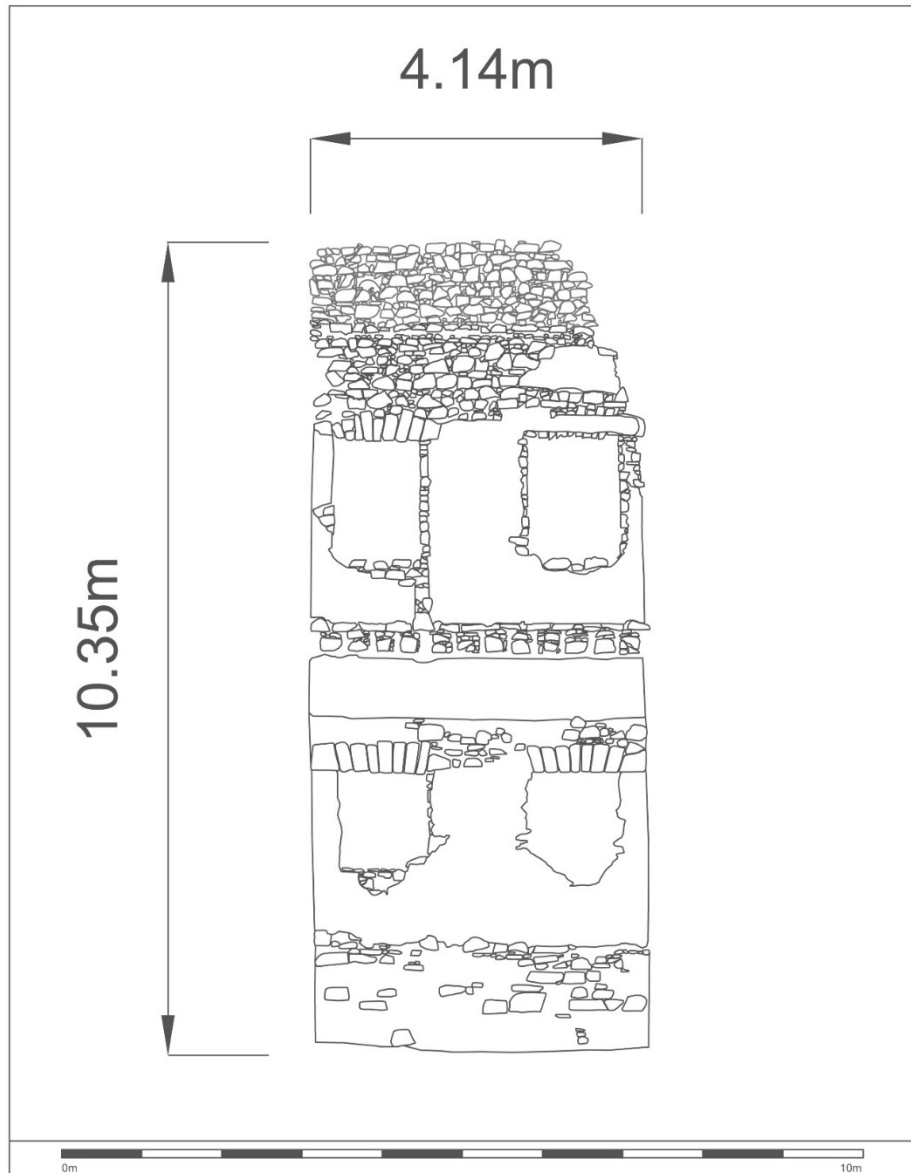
Internal elevation of the north-east wall of the signal tower at Mullaghderg Hill Signal Station.
